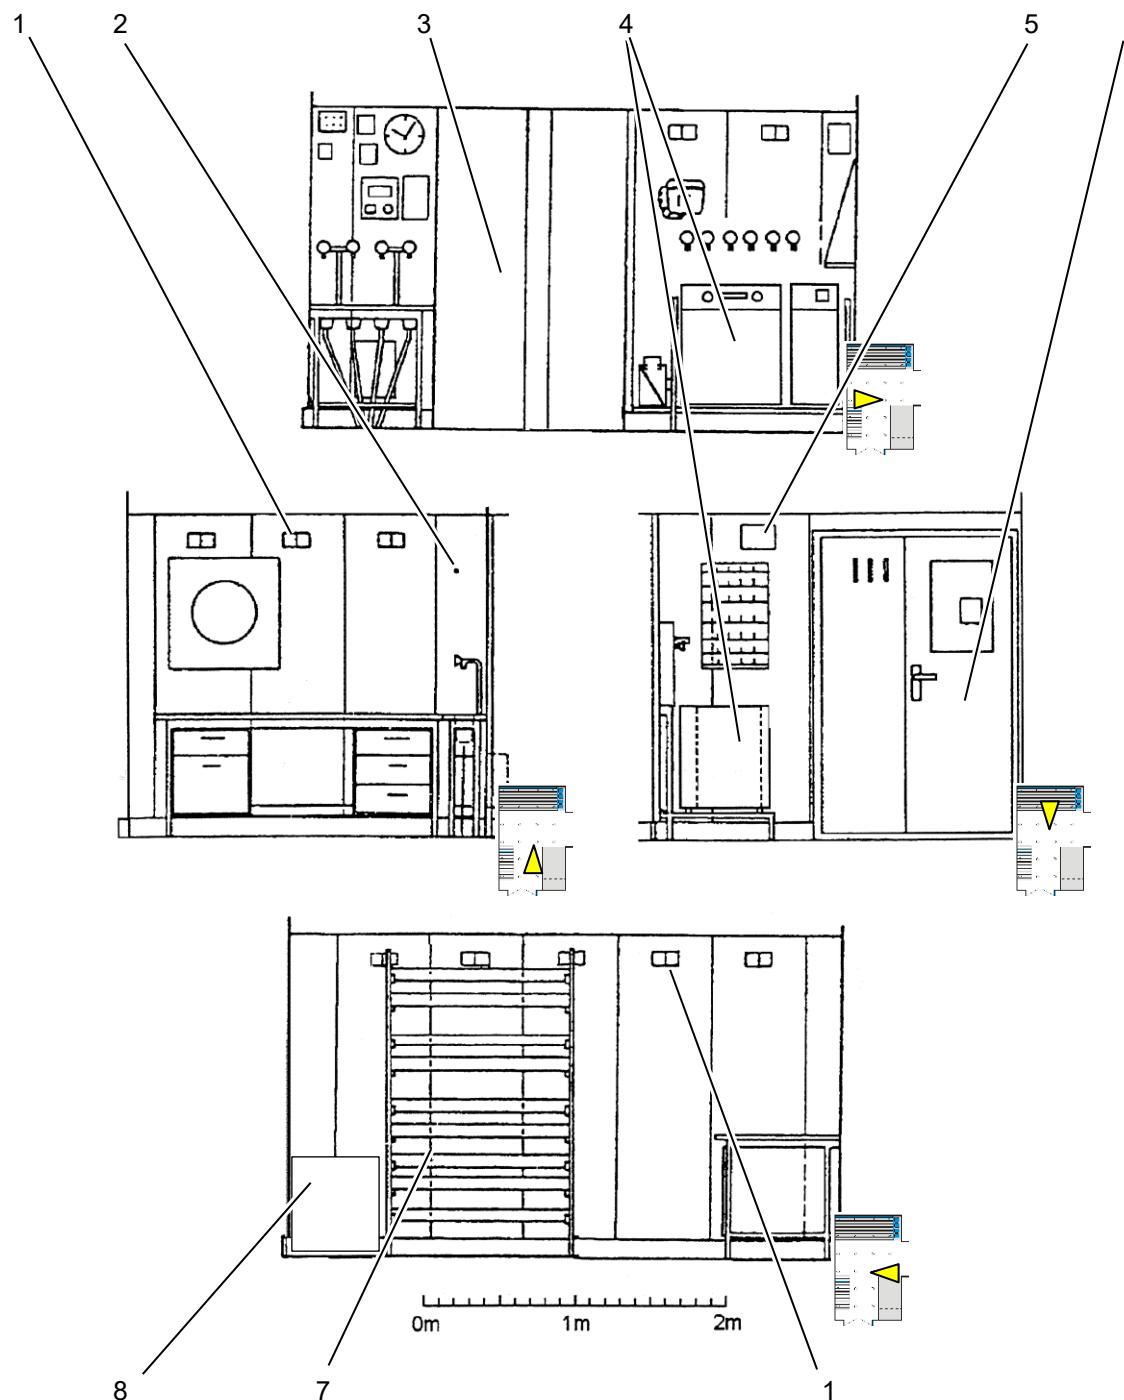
Dry laboratory 8 (detailed plan laboratory walls, status 1986)
